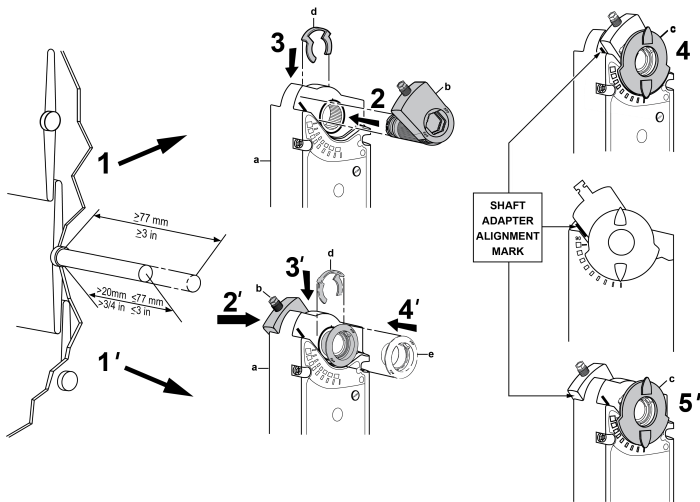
Shaft Adapter Placement for Clockwise Rotation on Short and Long Shafts.
